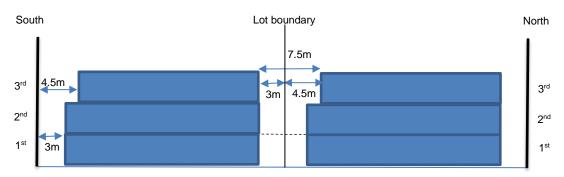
Example of R60 side building setback. Front view showing side setback (where building length is less than 16m).
